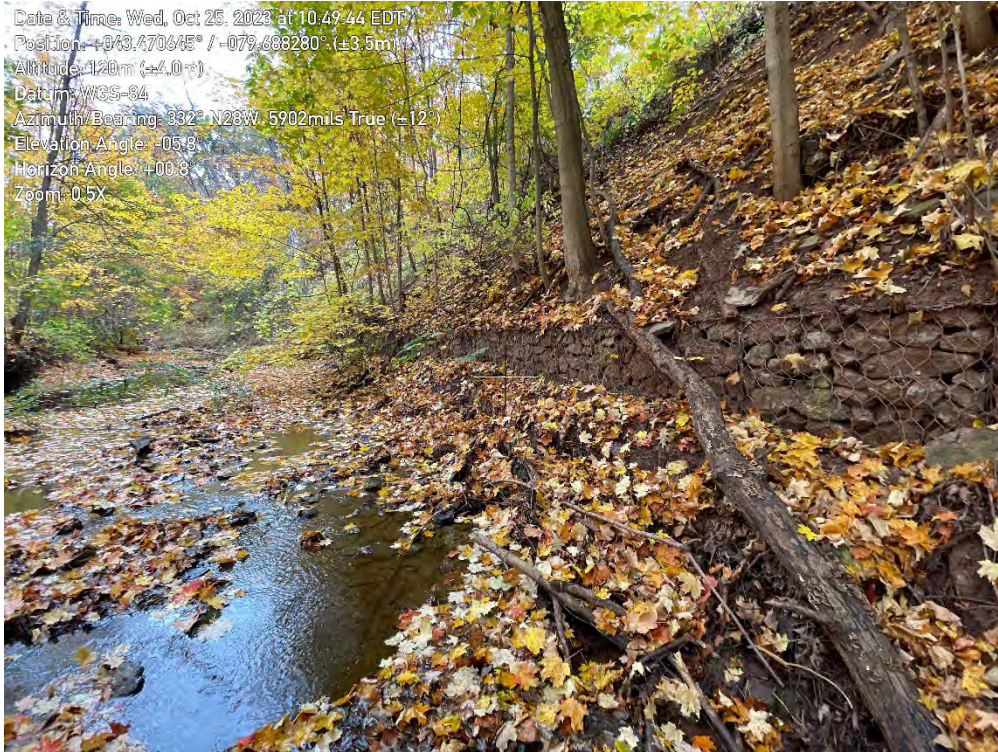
View of slope crest in Zone B2 at 1208 Lambeth Road, looking Northwest.
